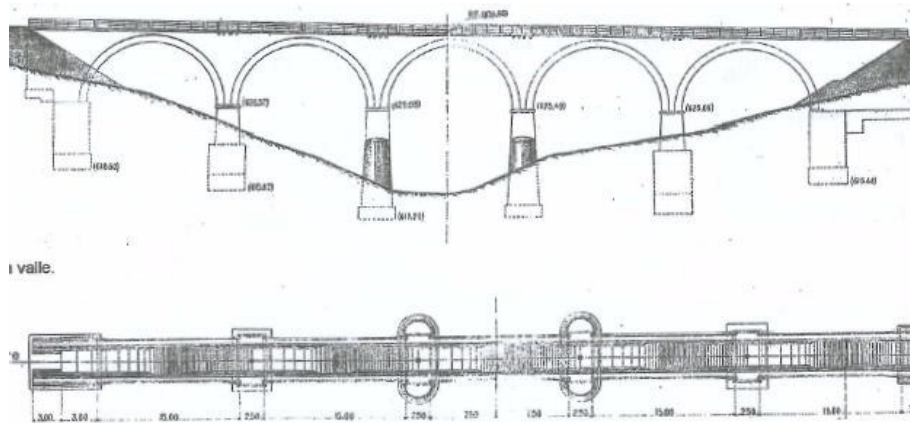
Longitudinal and upper views of Avella Bridge.
